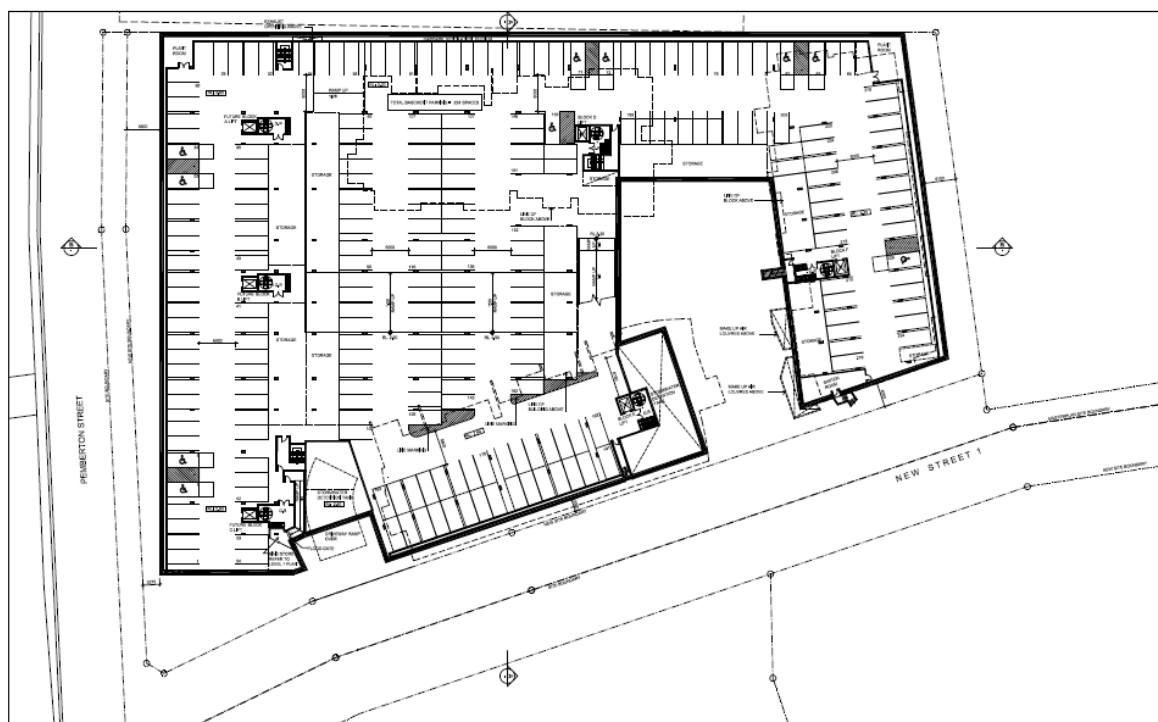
Basement Plan of 42-44 Pemberton St – source Krikis, Tayler Architects.
